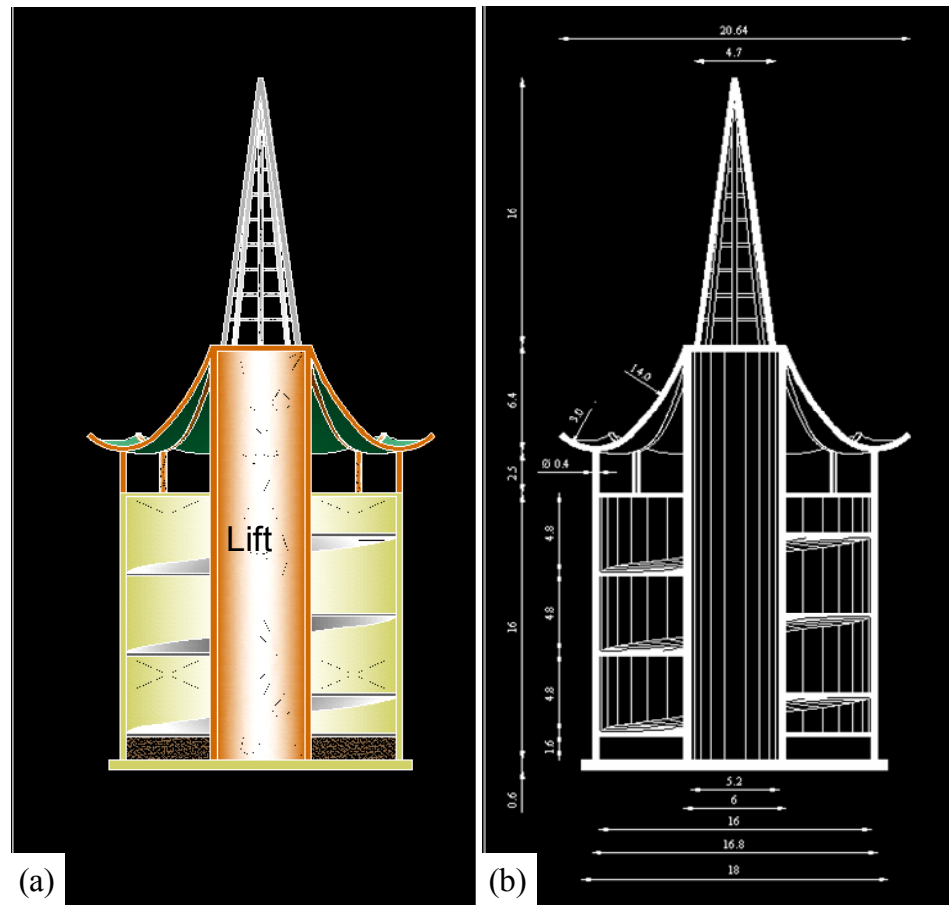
Vertical sections of the vehicular access structure: (a) location of the lift; (b) geometrical details of the ramp and the roof (m)
